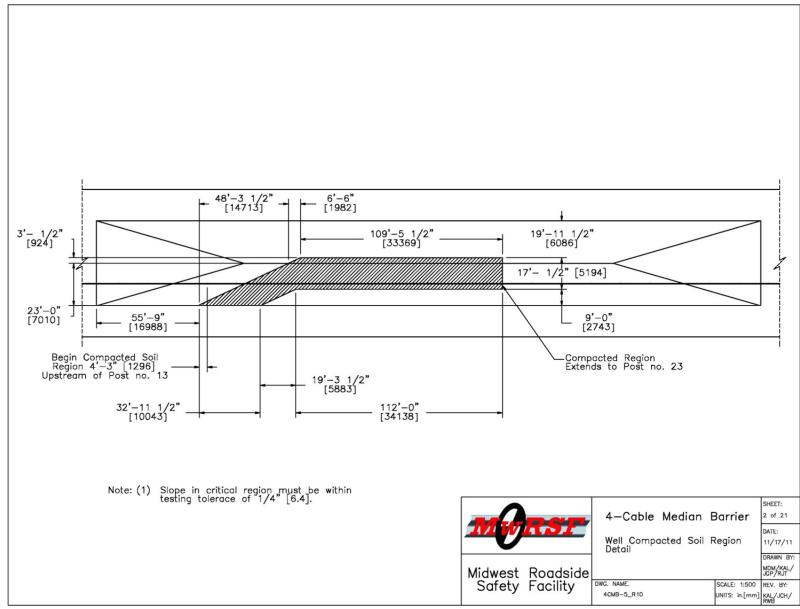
Soil Compaction Layout, Test No. 4CMB-5
